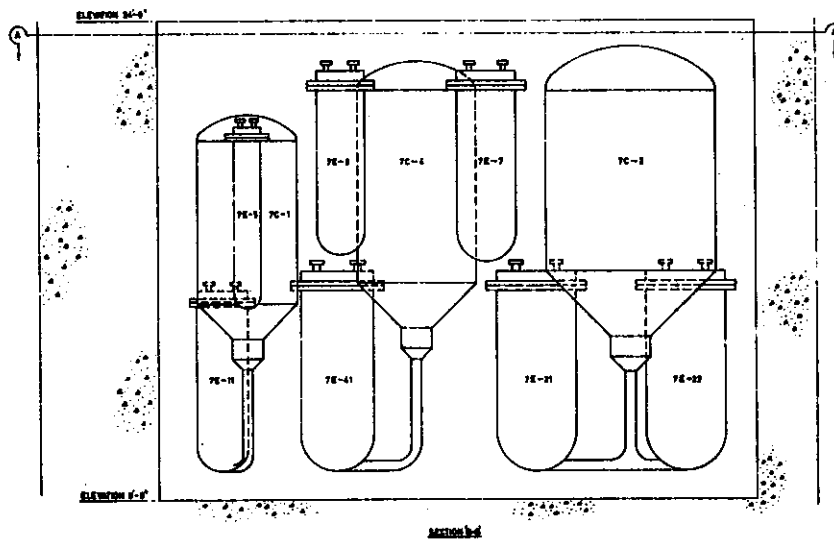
EQUIPMENT LAYOUT - SOLVENT WASHING AND OFF-GAS TREATMENT
